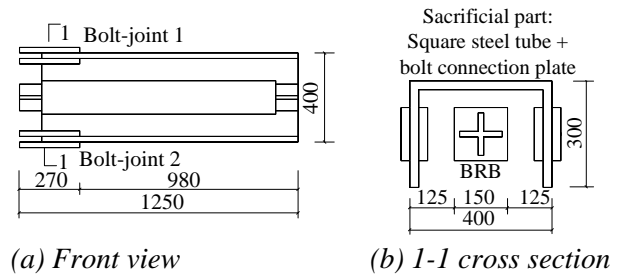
Dimension of the brace of SEDO (Unit: mm)
